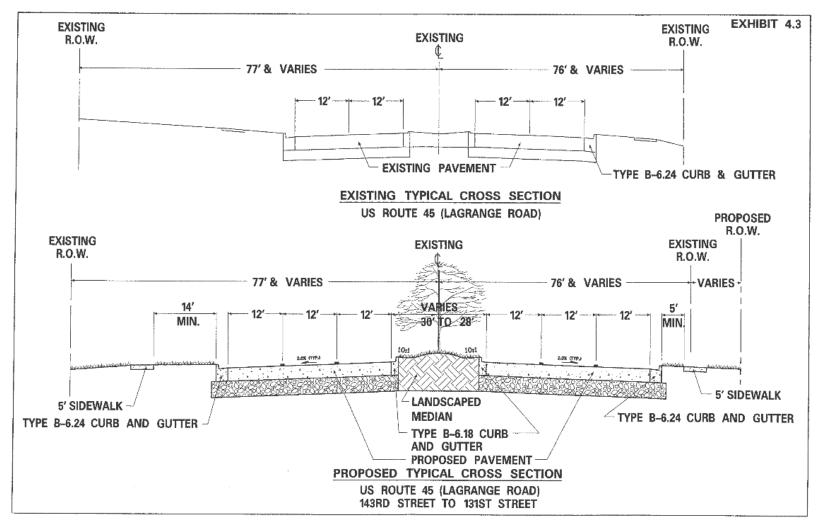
Existing and IDOT Proposed Typical Cross Section, 131st Street to 143rd Street
